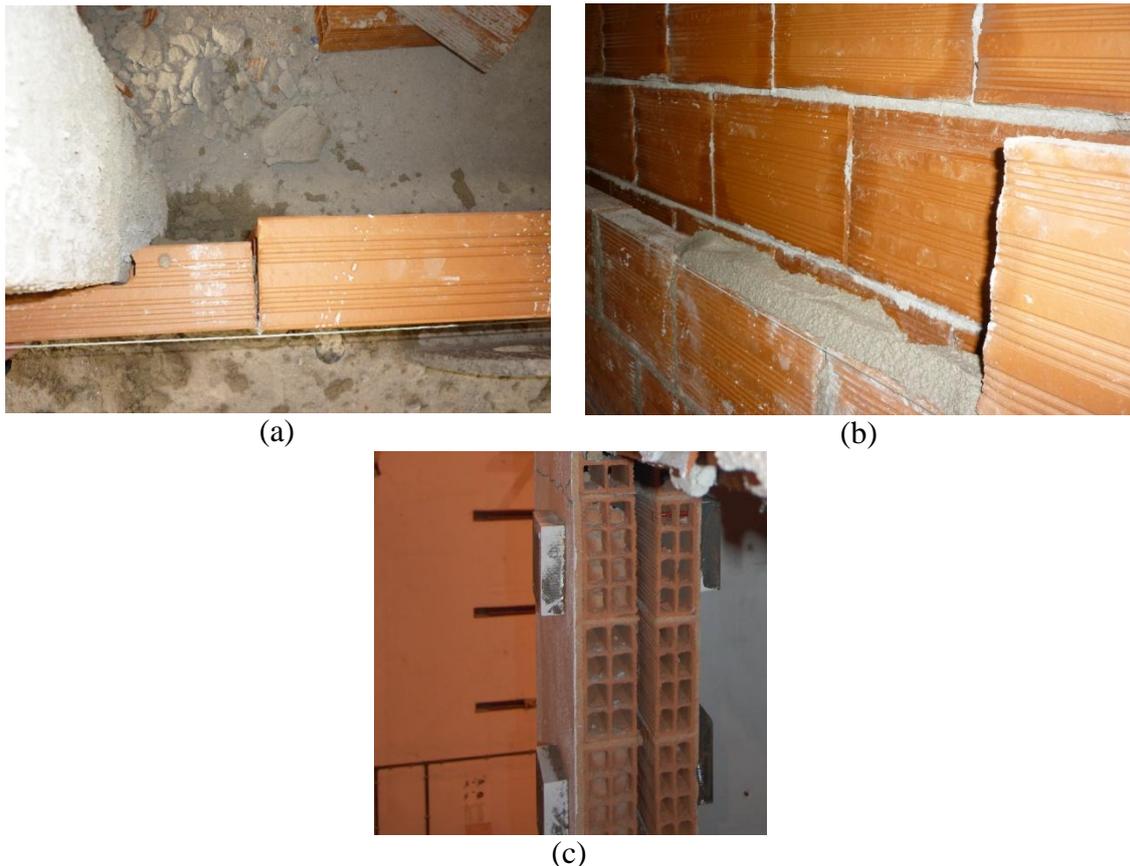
Infill solution of model one, a double leaf clay brick cavity wall with pre-batched mortar: (a) outer leaf; (b) inner leaf; (c) final work with mortar rendering outside and plaster inside.
